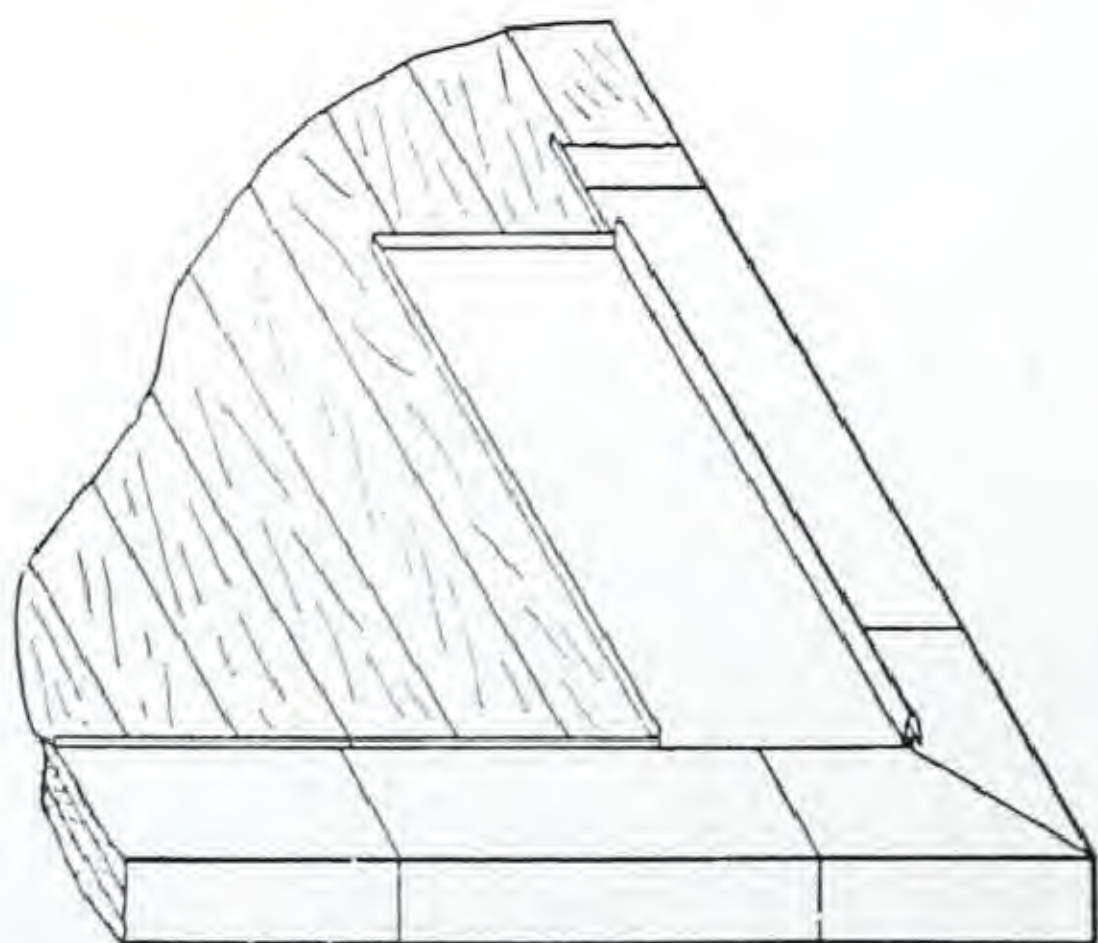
First Sheet in Position Showing Lower Horizontal Seam Finished.
